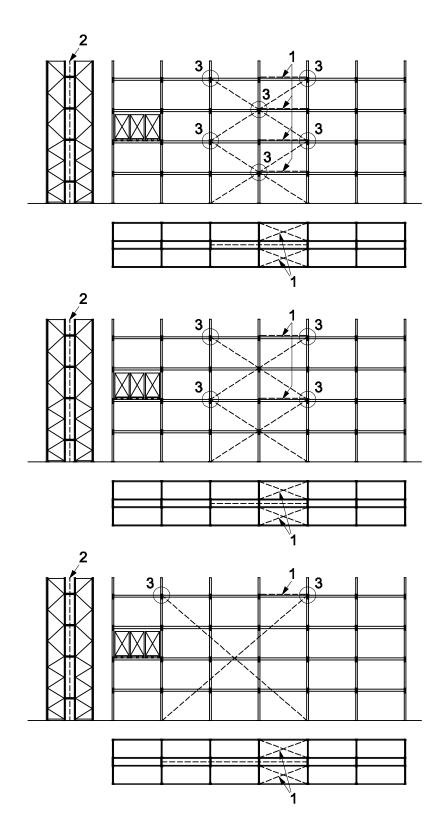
to 11 show examples of regular and non-regular racks in plan and elevation.
